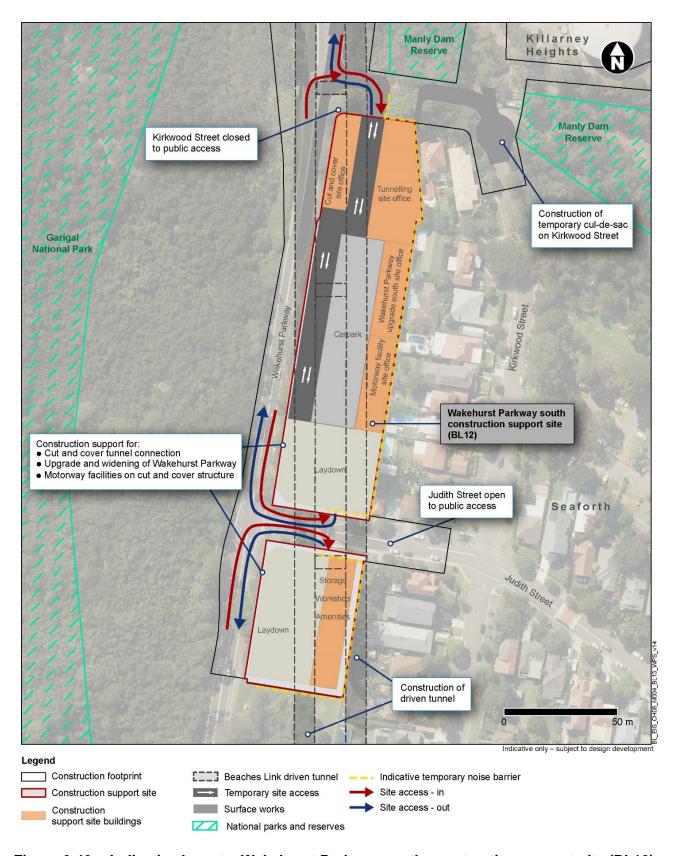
Indicative layout – Wakehurst Parkway south construction support site (BL12)
